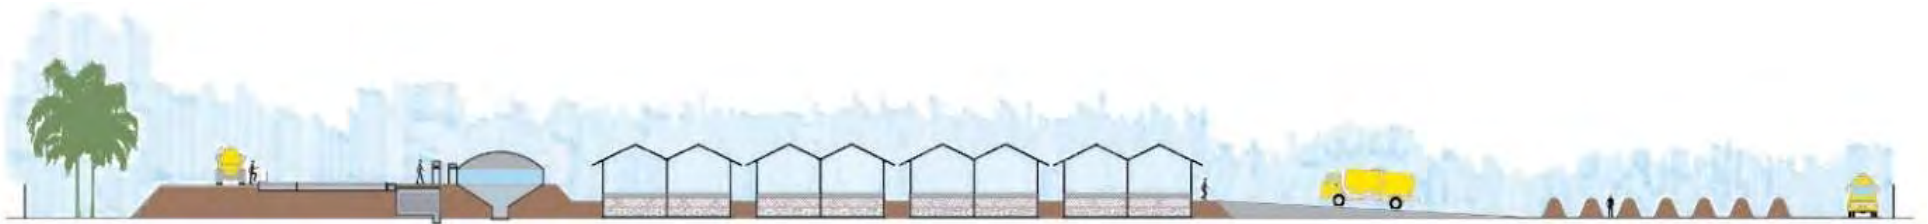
Longitudinal section view of the FSTP site for Paramaribo.
